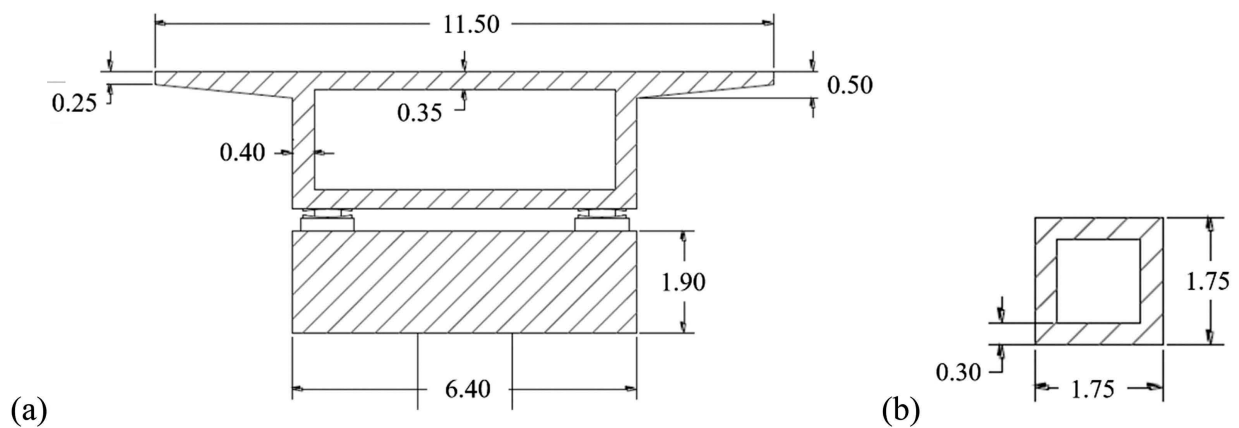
(a) Cross-section of the RC cassoin deck and pier top. (b) Cross-section of the three RC piers.
